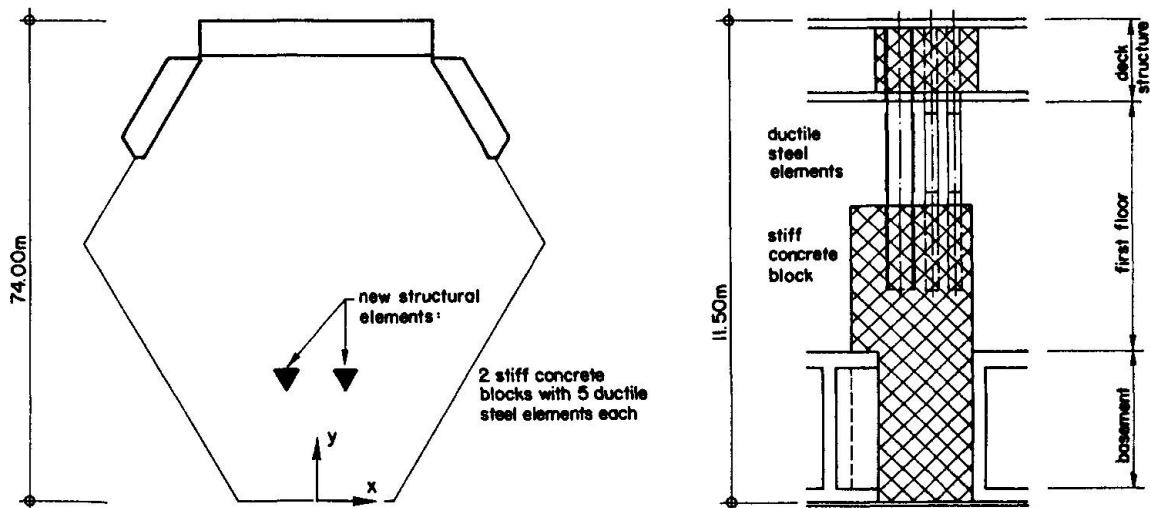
Upgrading variant "capacity design" with ductile steel elements in a stiff concrete block; left: plan view; right: sectional view
